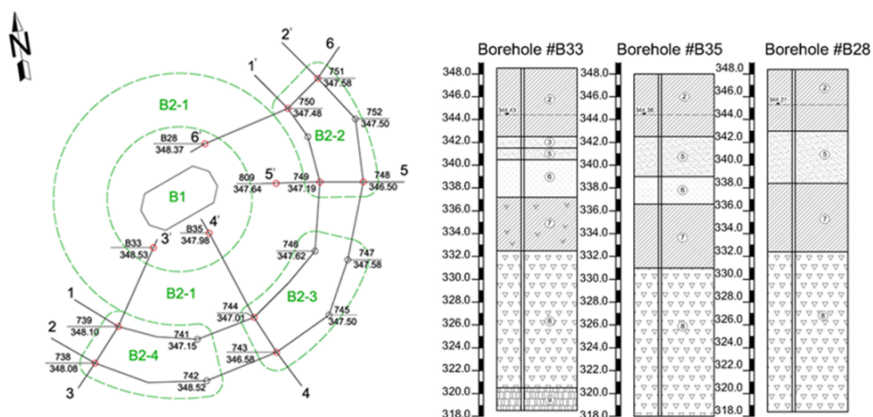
Plan for the location of boreholes at the construction site (Build – B1) and EG cross section.
